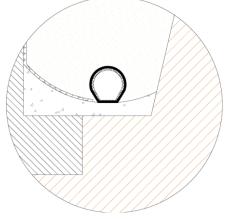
PRINCIPLE OF THE SHAPE OF THE CONCRETE CHANNEL
